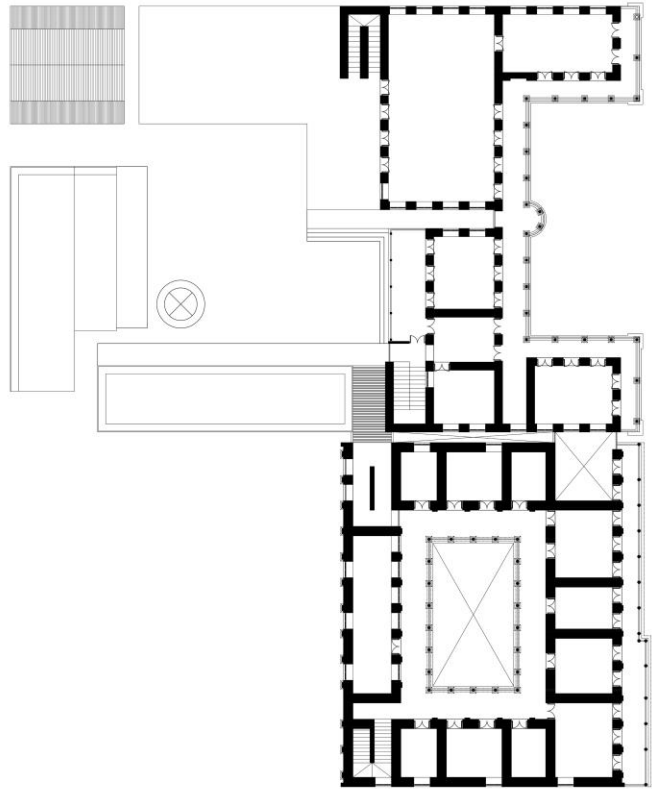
First floor_ Building 2 & 3 (Source: Author)
